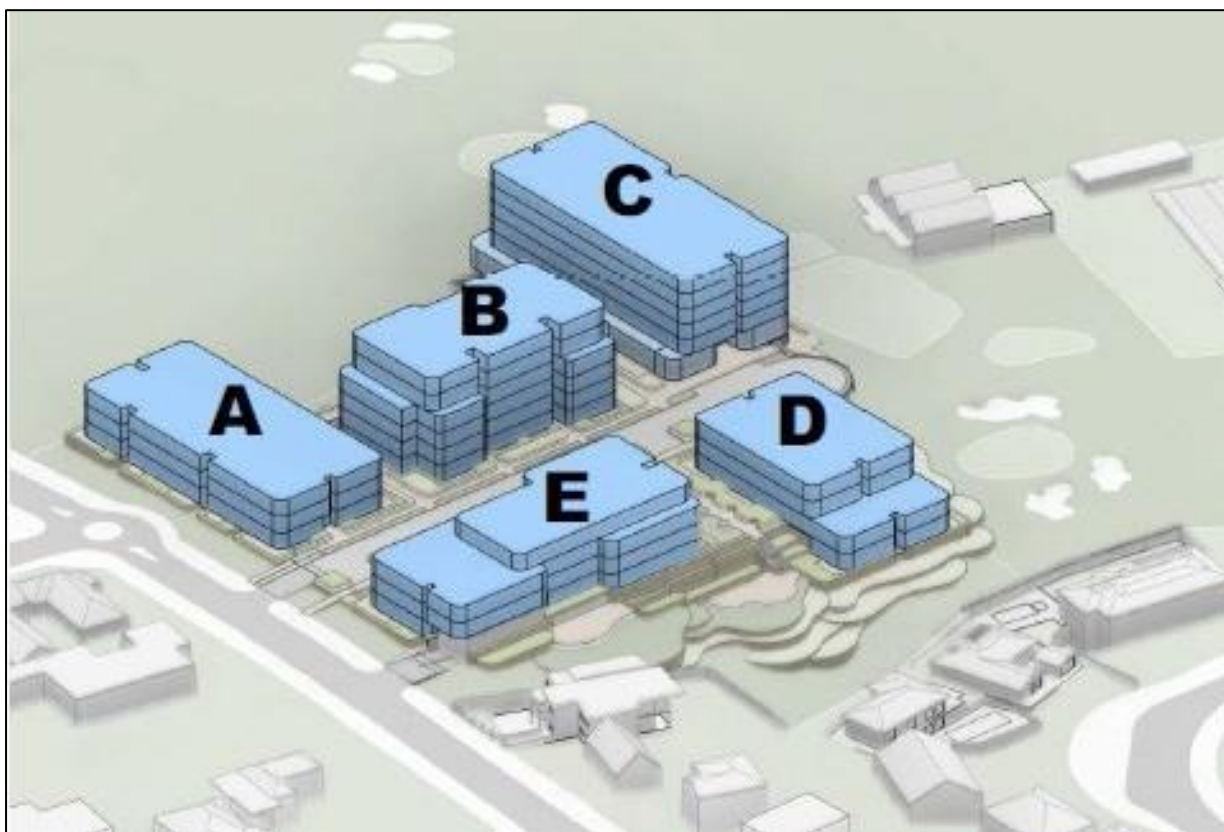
Pre-lodgement application - Concept Built Form Massing, Mirvac Design, 2022
